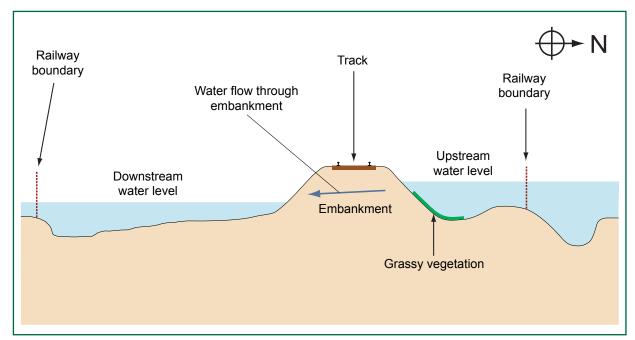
Schematic cross section through embankment at the failure location, showing difference in water levels across it
